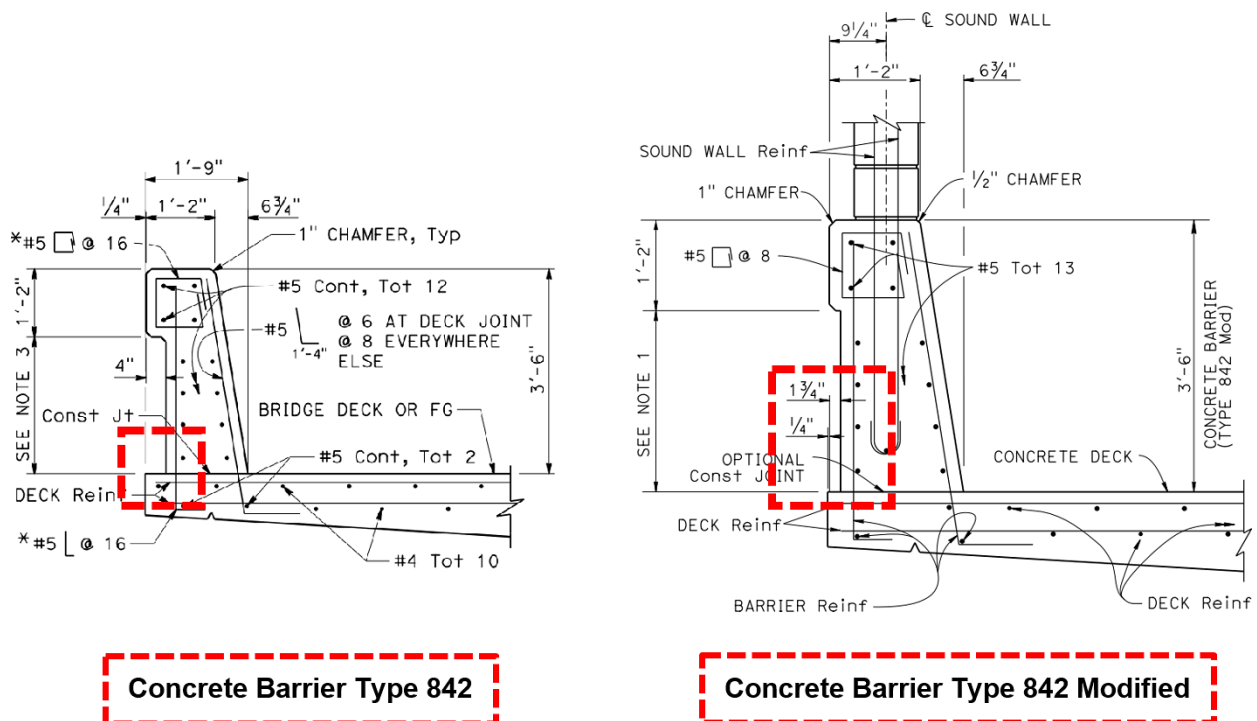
Standard 842 Barrier and Modified 842 Barrier
